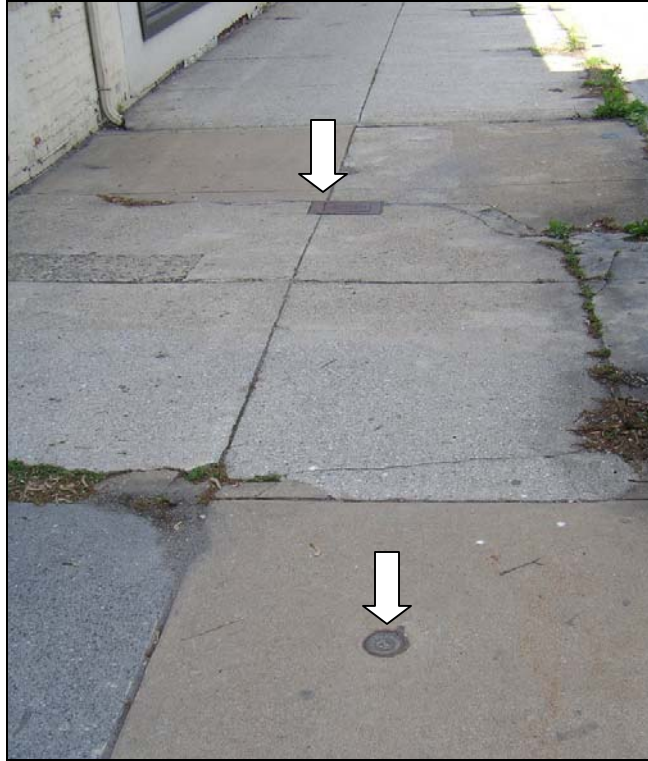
Photo C: Caps in sidewalk for abandoned heating oil UST (146-150 North Beaver Street)
